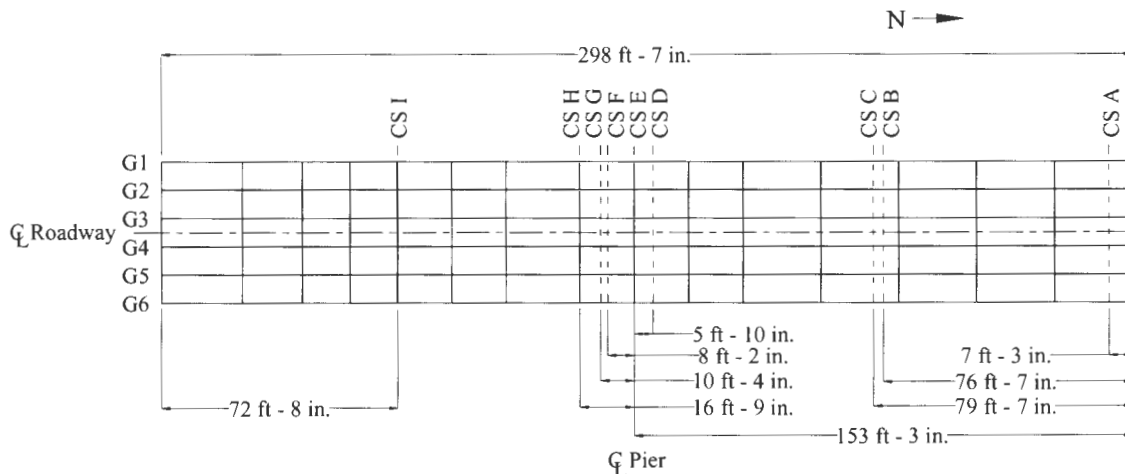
Plan view of the E. 12th St. Bridge showing the cross-sections where sensors were installed.
